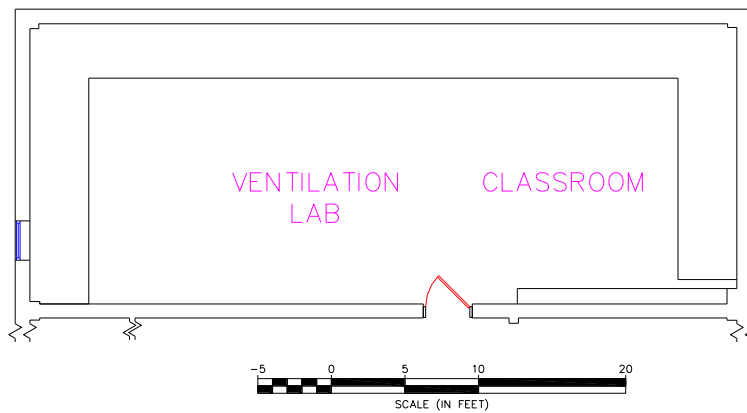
FLOORPLAN OF VENTILATION LABORATORY
